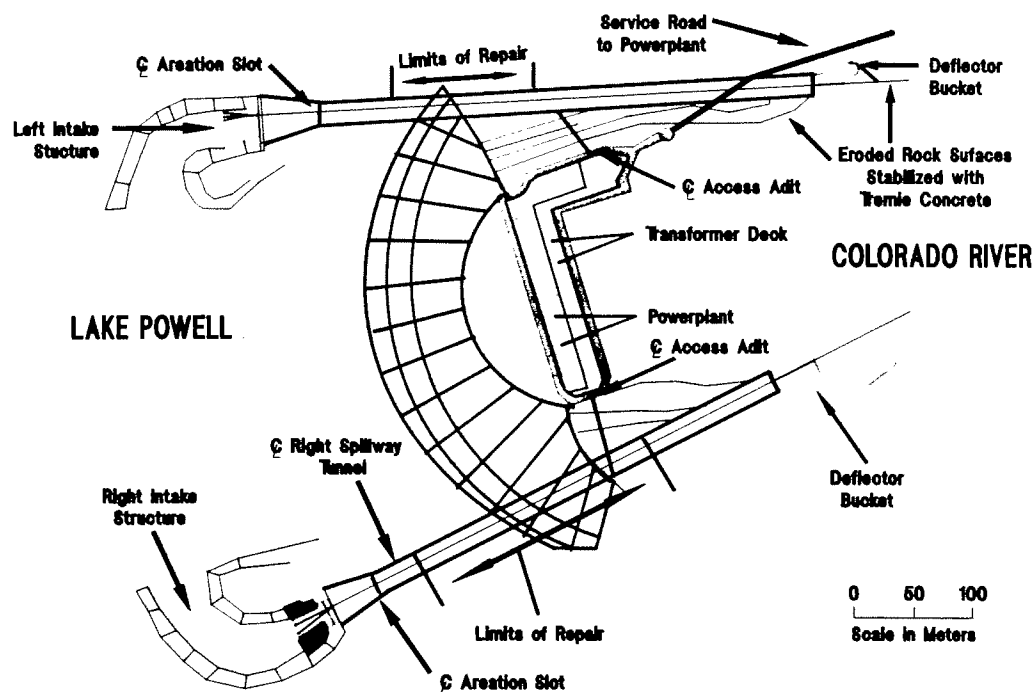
Plan view of the 216-m-high Glen Canyon Dam.
